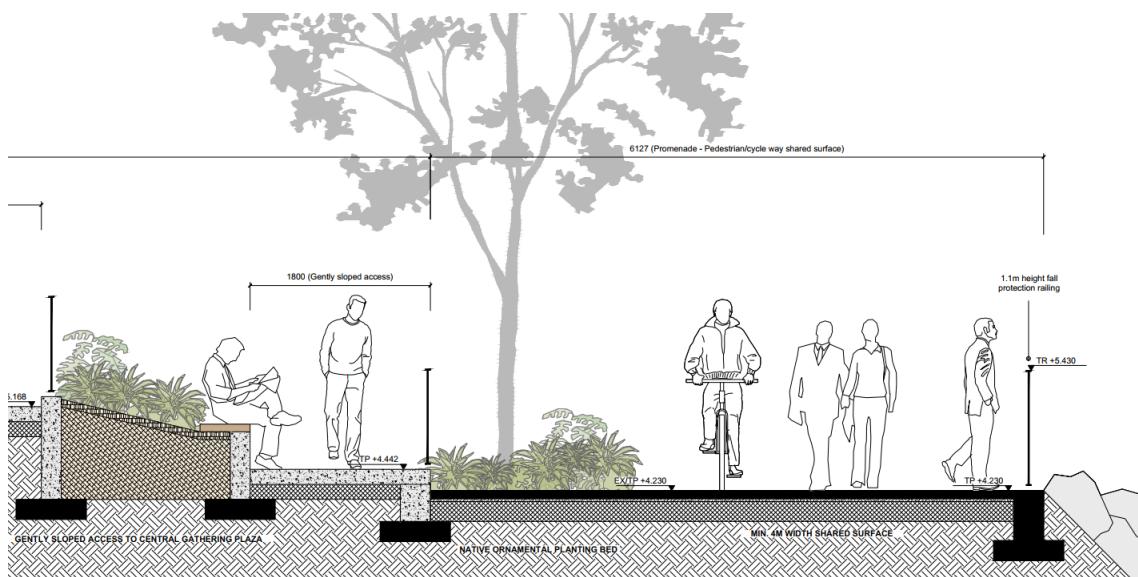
Landscape Sections (Drawing No. 24-612-SDA-PD-DR-GF-203)
